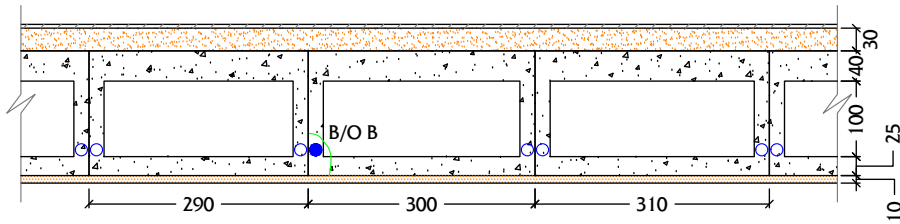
PART SECTION LOOKING EAST THROUGH ROOF SLAB SHOWING DETAILS OF PRECAST CONCRETE PLANK - SURVEY AREA RS2 SCALE 1:5
